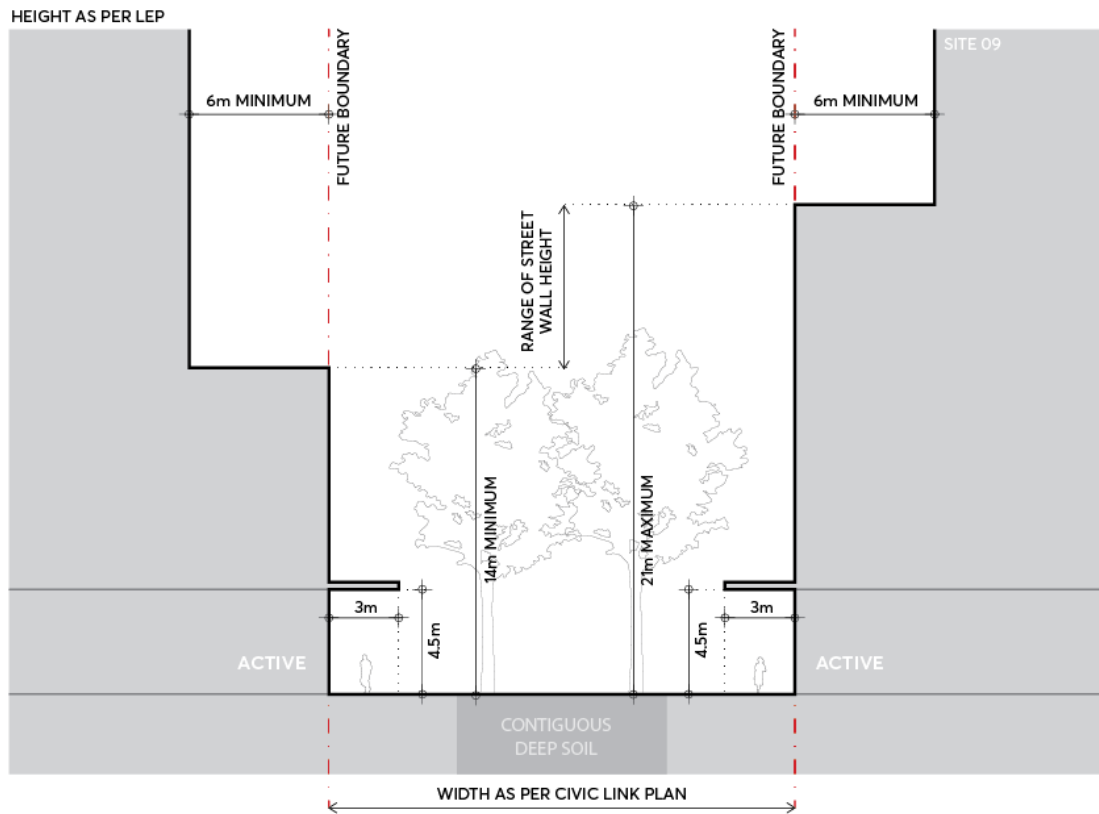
Future Civic Link in Block 3 (Section H) Setback & Building Height
